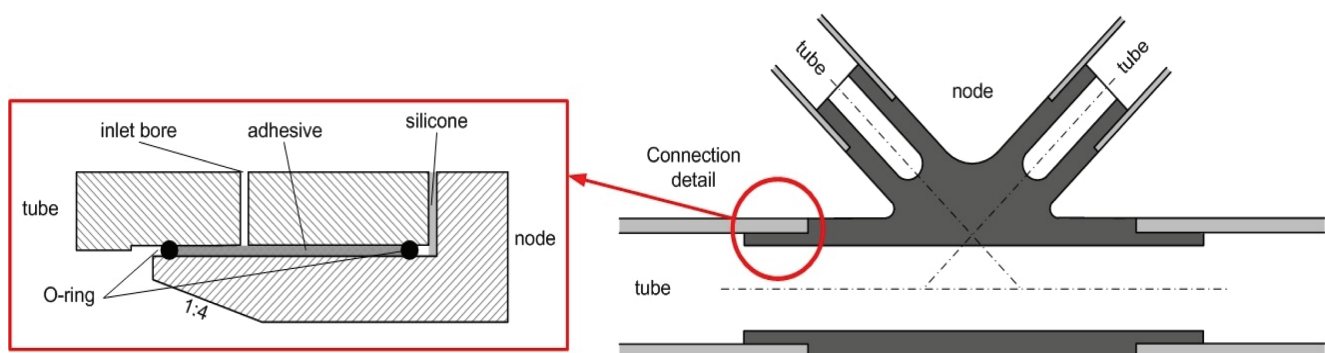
Potential connection detail with cast steel elements and adhesive joints. (Figure courtesy of Professor Thomas Ummenhofer)
